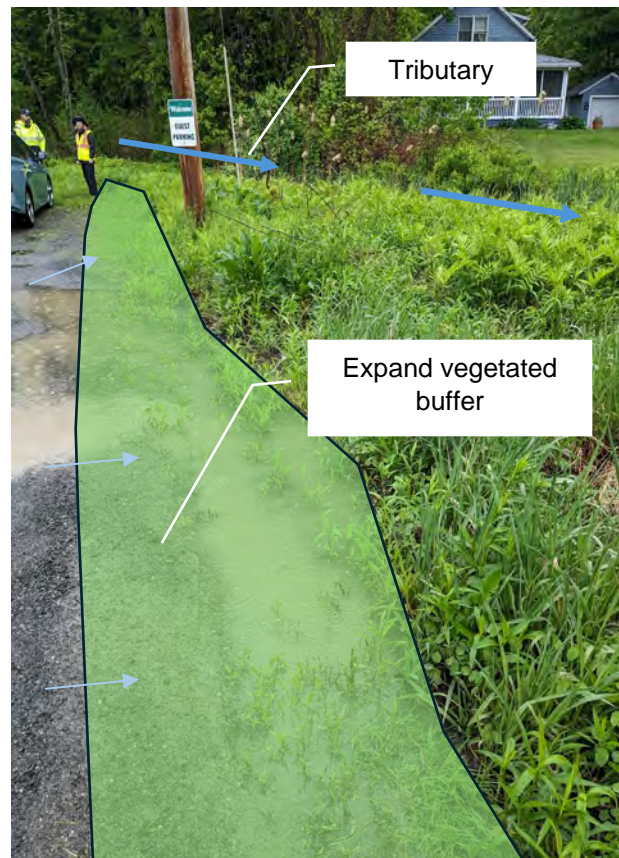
Sediment laden runoff at the edge of the parking lot
